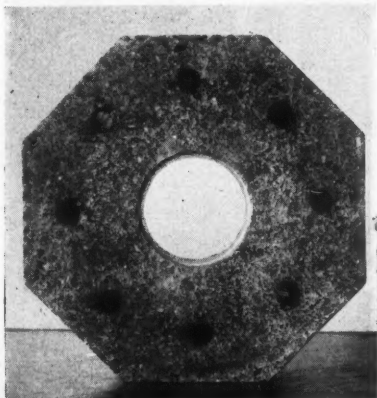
(Top Right). Section through a spun concrete column. Fig. 2 (Above). Showing the apparatus used for pumping concrete into moulds.
